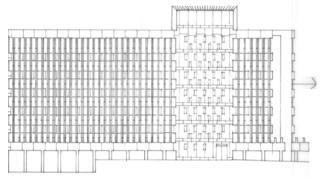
University of Queensland: Birrell's J.D. Story building facade.
